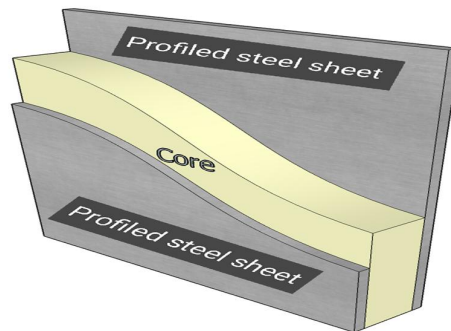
Profiled Steel Sheet – Concrete Composite Sandwich Panel
